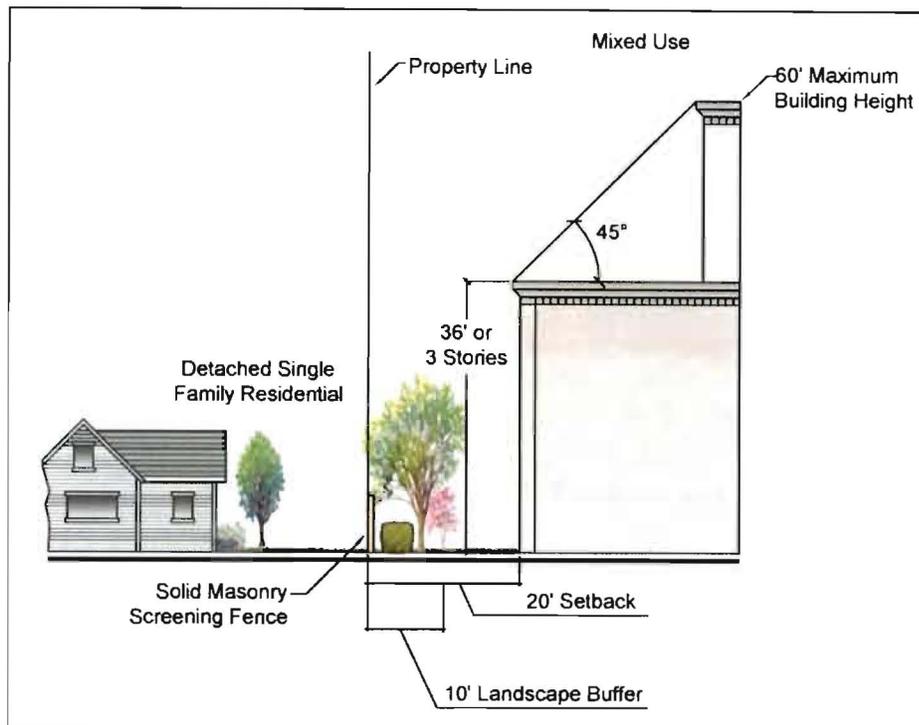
C-2, Example of Setback on Shallow Parcels Adjacent to Detached Single Family Zoned Residential Areas
